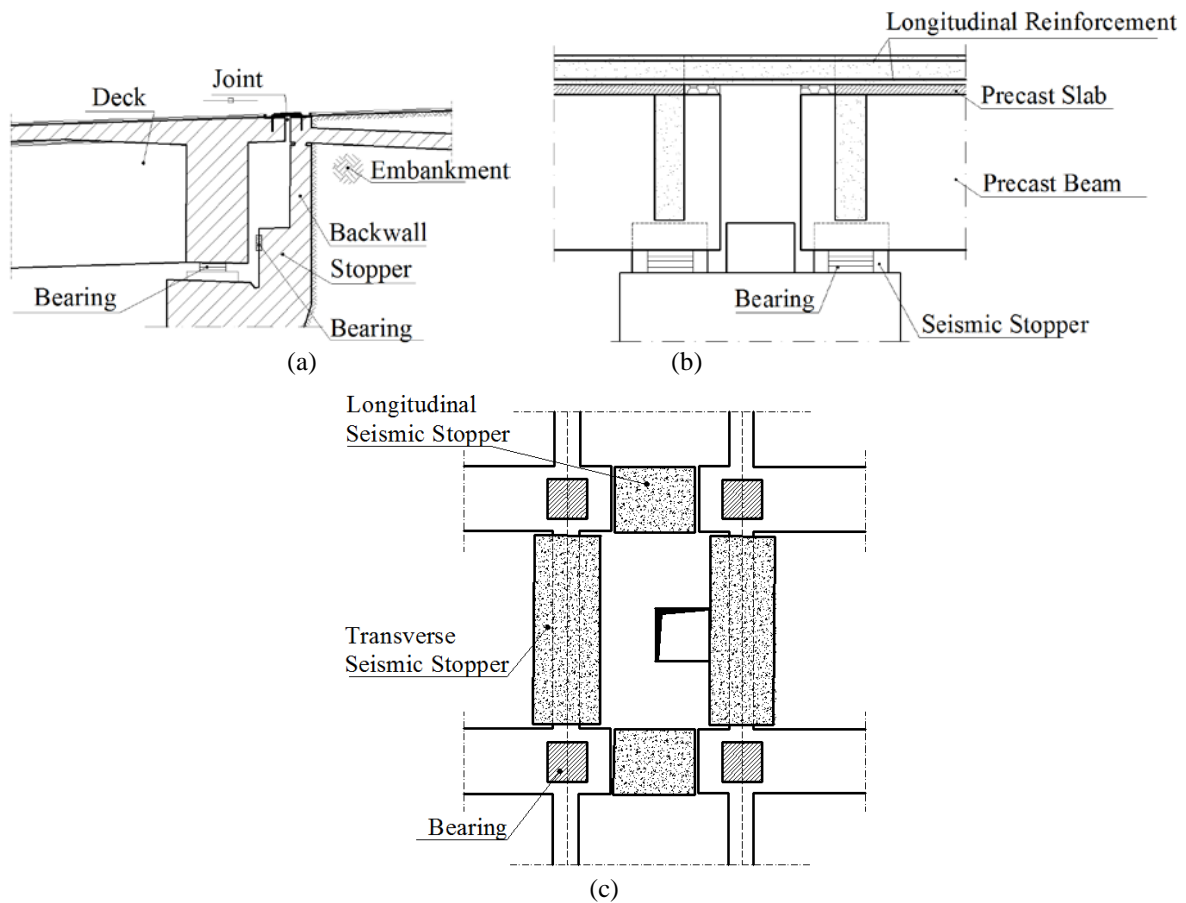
(a) Seismic stopper at abutment, (b) Longitudinal seismic stopper at pier of a precast I-beam bridge and (c) Plan view of a pier's head
